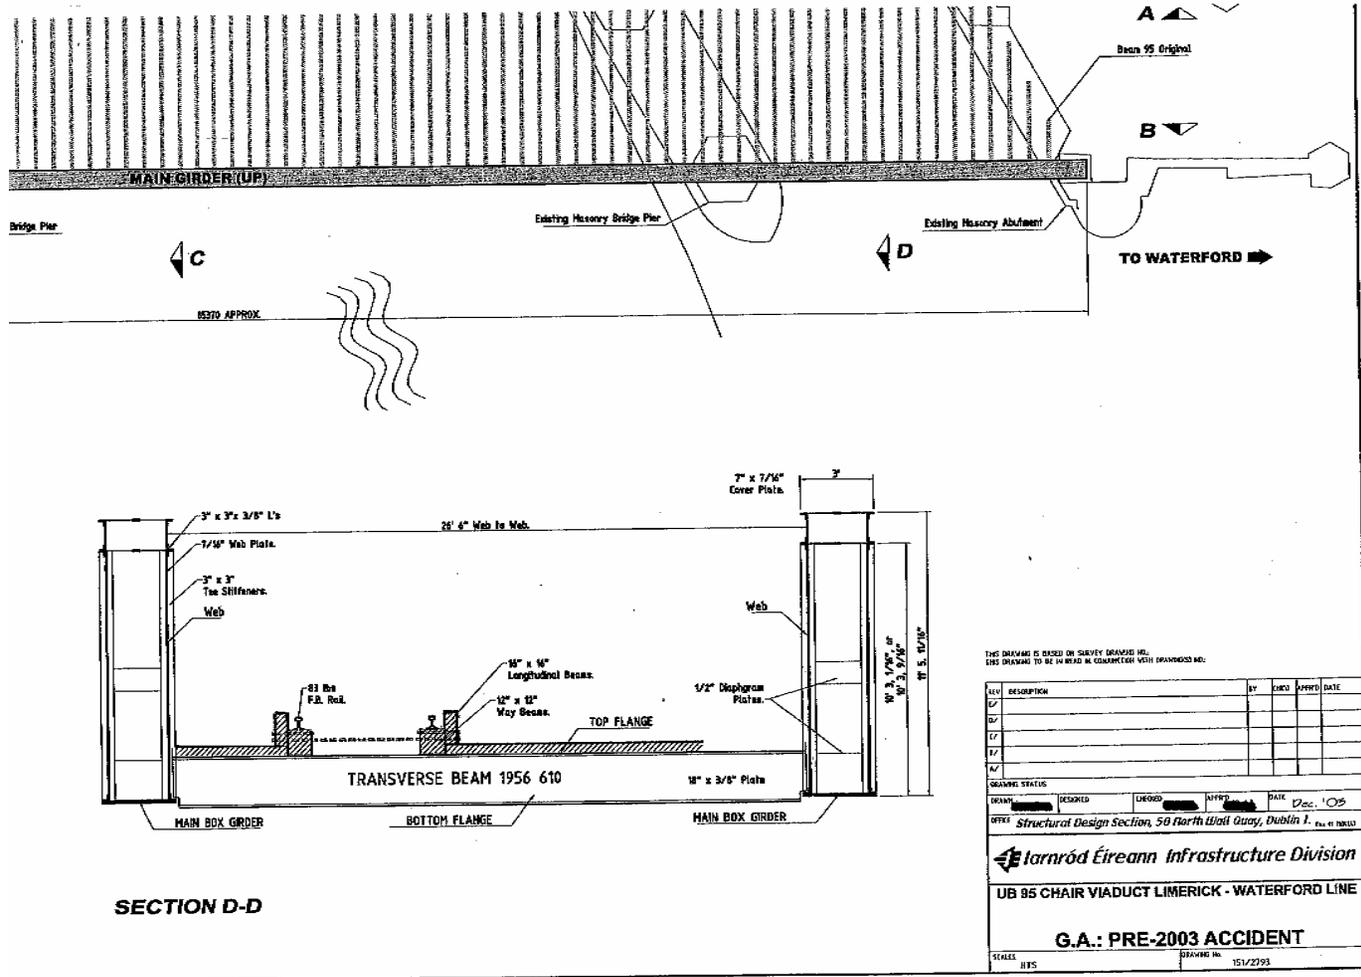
Cross-section of structure pre-2003 accident (IÉ Structural Design, 2003)
